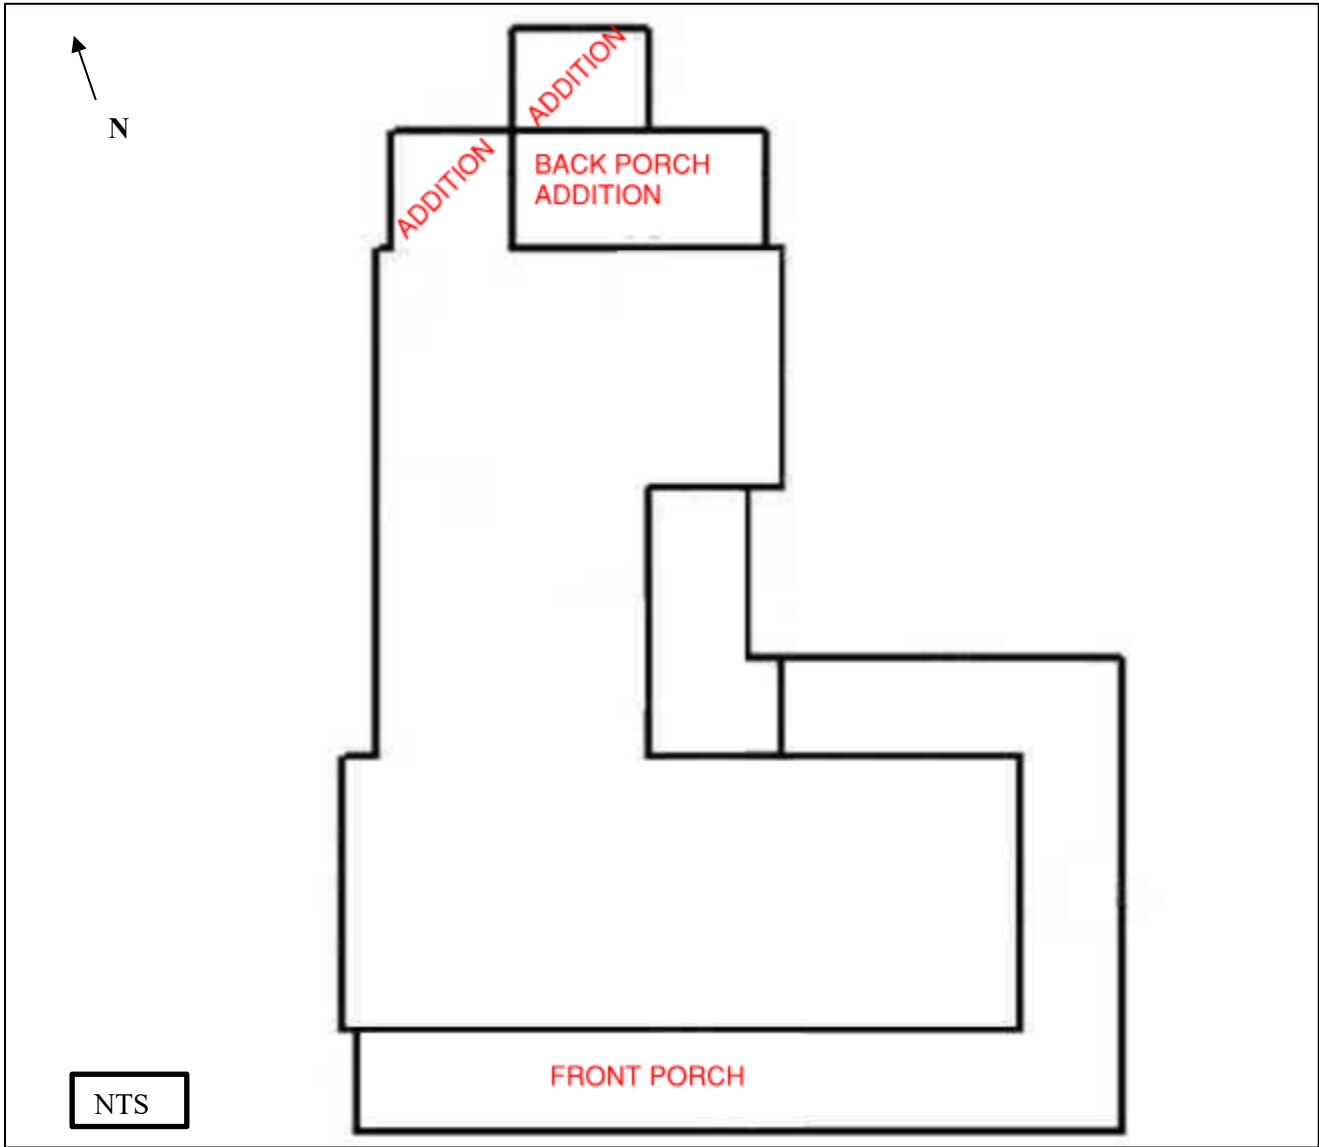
Hand-Drawn Site Plan of Jones Tenant House at 2617 Rolesville Road, 2025
